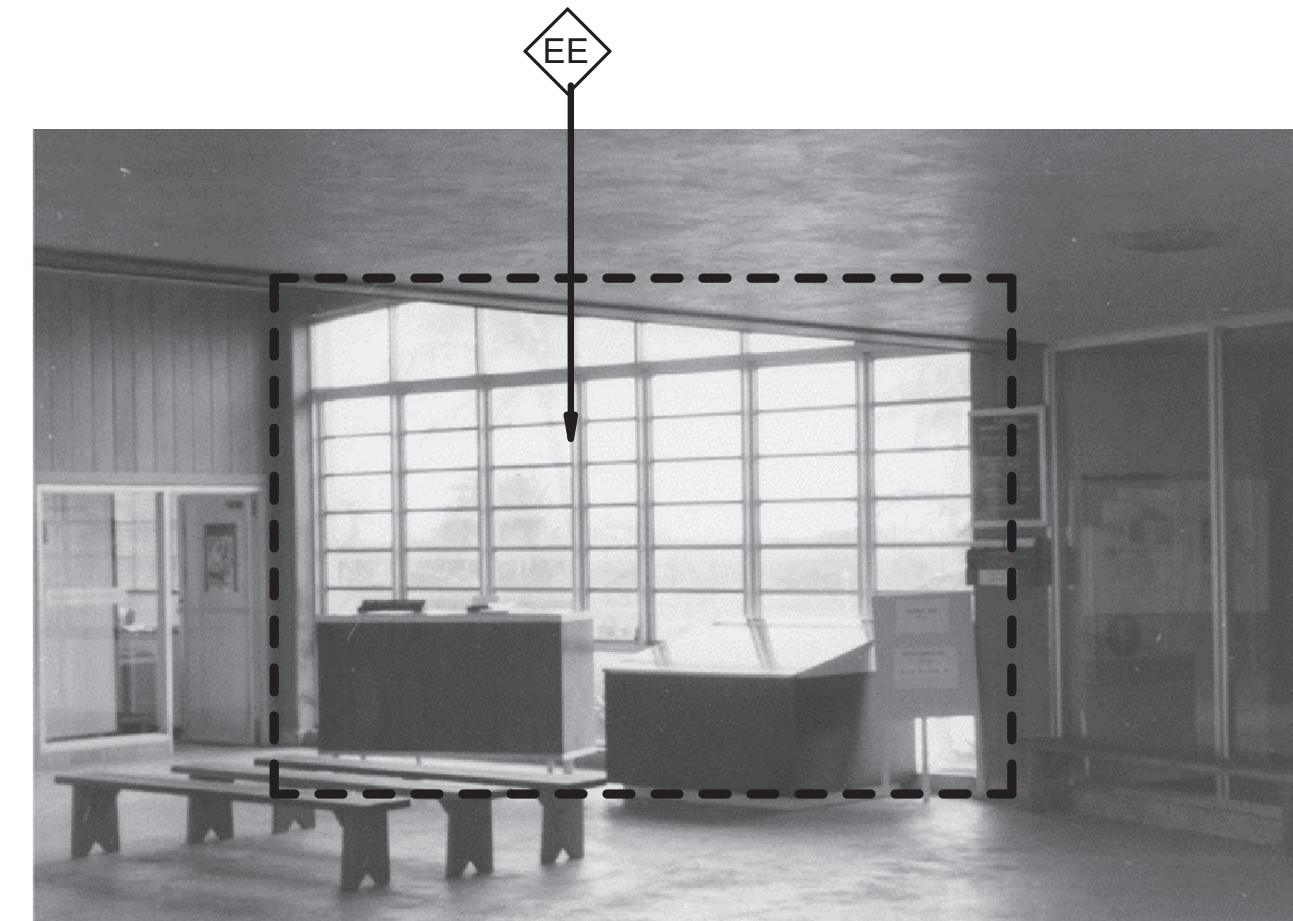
LOBBY STOREFRONT ON EAST ELEVATION (1960)
